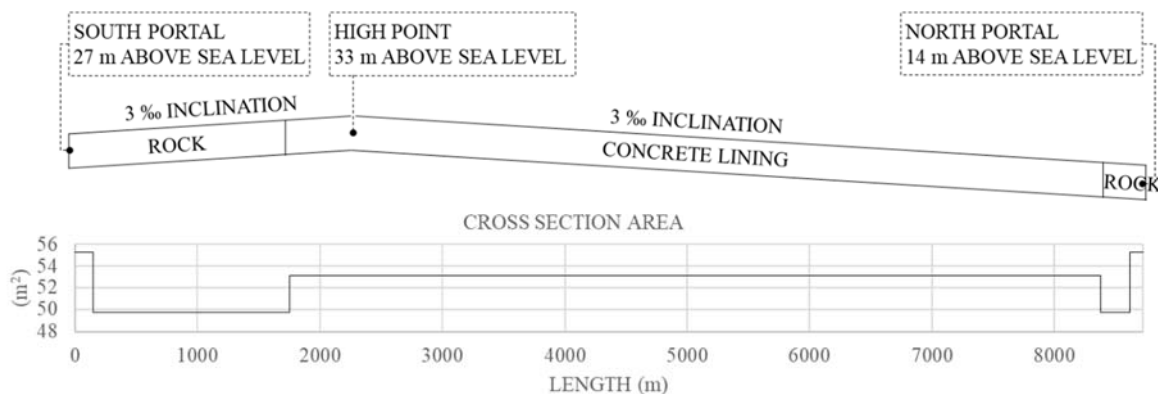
Tunnel height profile, cross section area and parts with concrete lining vs bare rock.
